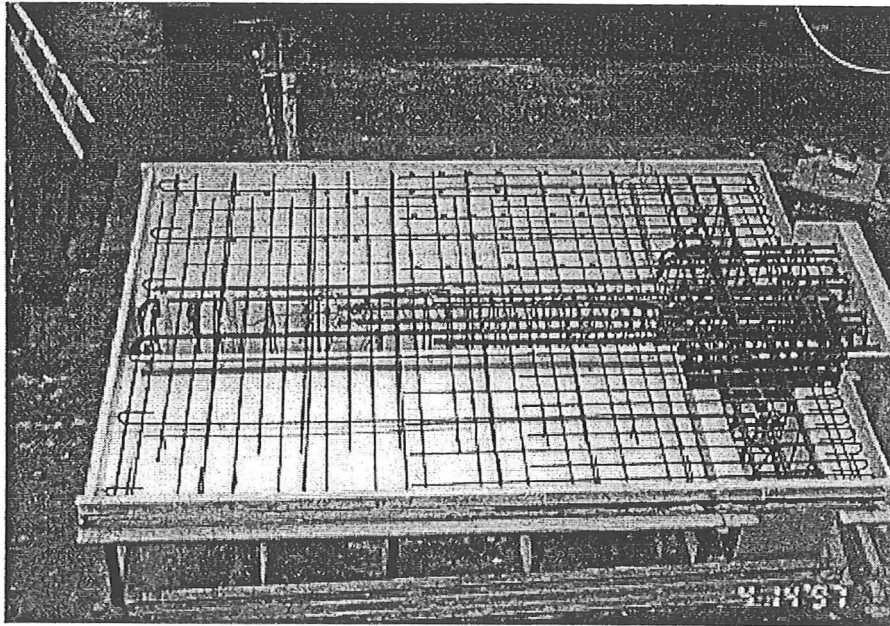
Details of Test Specimen Prior to Casting of the Concrete
